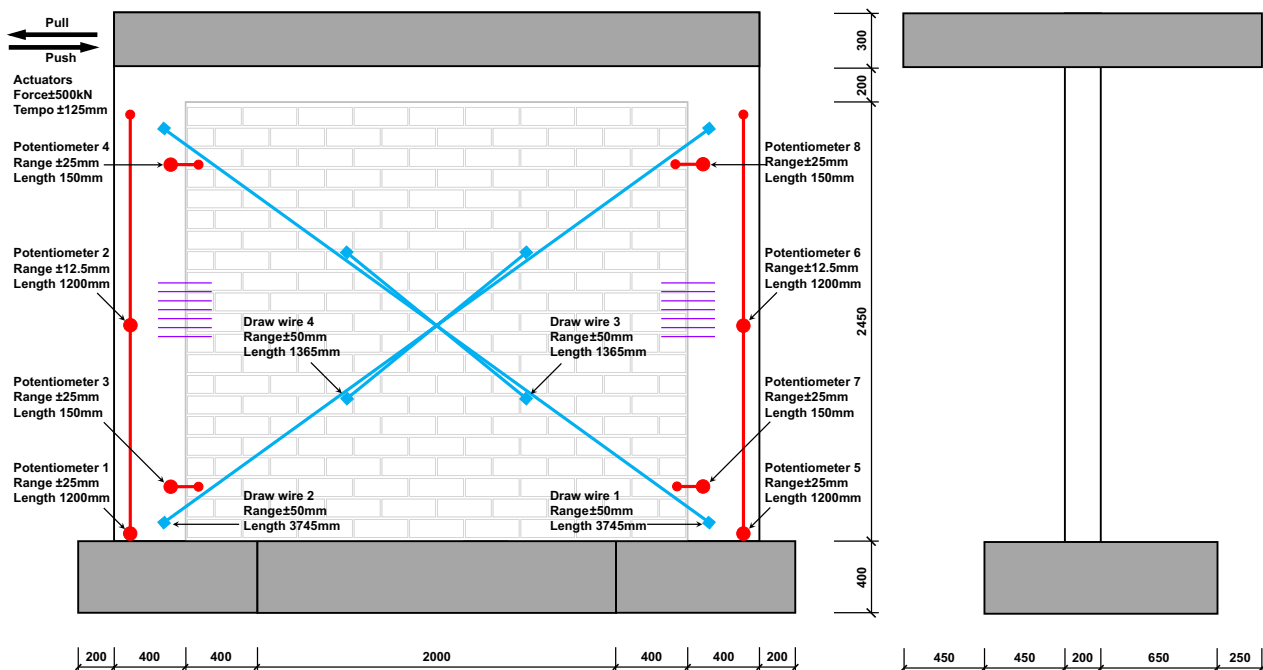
Details of the instrumentation (all dimensions are in mm)
